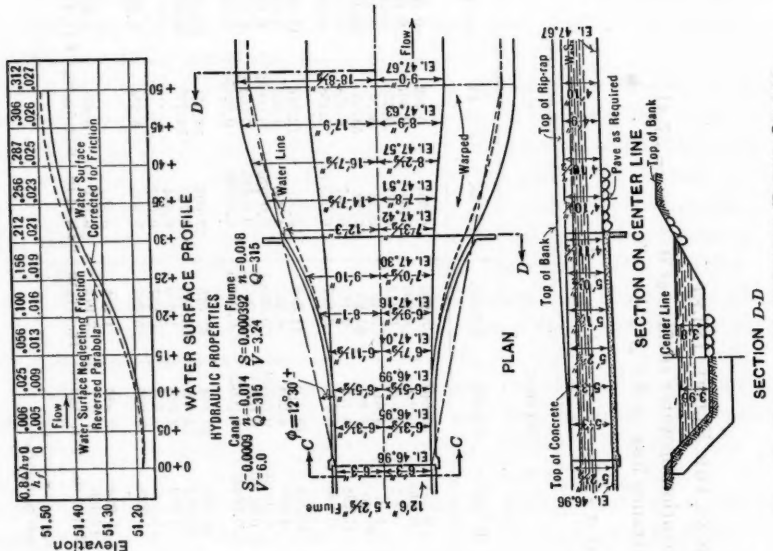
TYPICAL RECTANGULAR FLUME OUTLET.
